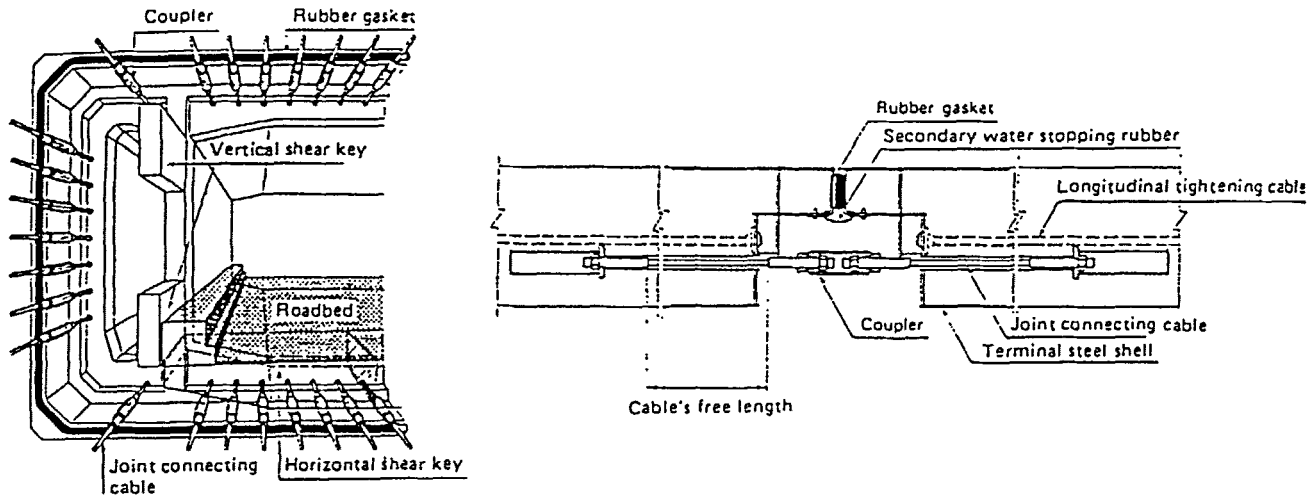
Flexible Joint of Osaka South Port Immersed Tunnel (units: mm)
